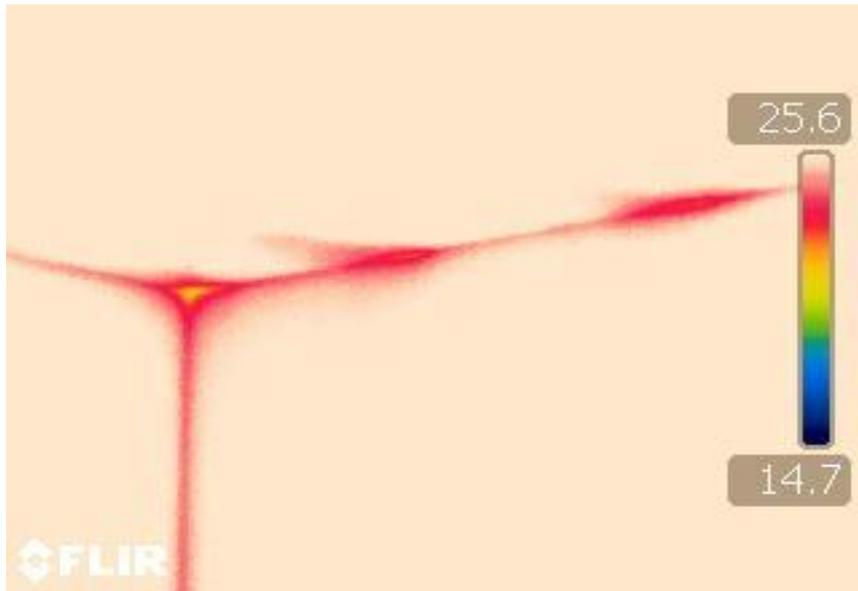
Top Floor Ceiling Joist Phase 2 Heat Loss
